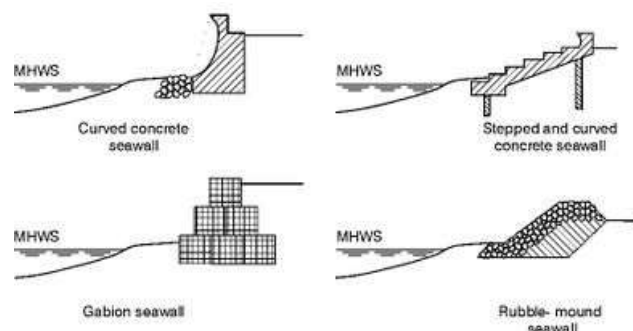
Seawall Building models and type (Triatmodjo, 1999)
